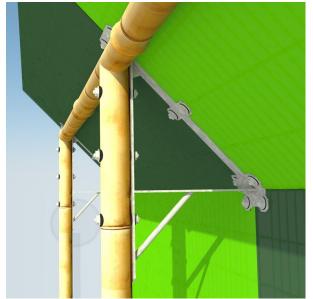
Center GMS Bracket Angle with Stainless Steel Bolts for 4 Panels Union. Front View.
